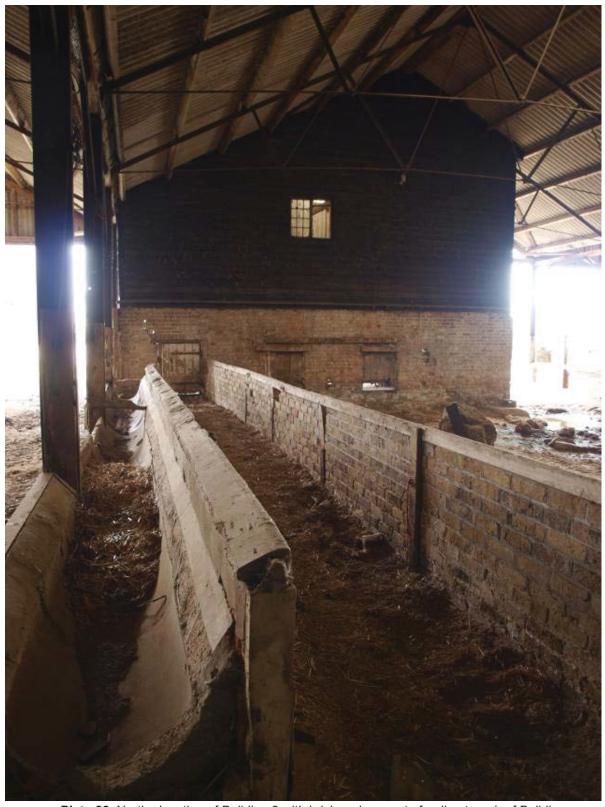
North elevation of Building 3 with brick and concrete feeding trough of Building 4 in the foreground.
